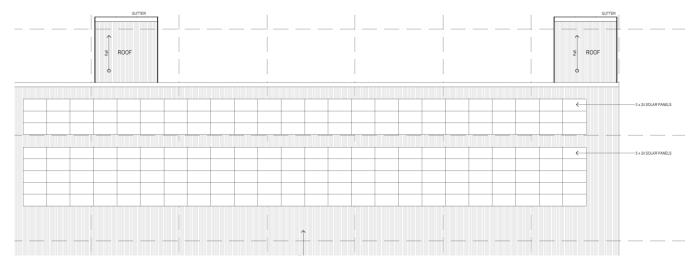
Previously proposed PV layout on the roof of Building J (Source: Fulton Trotter)
